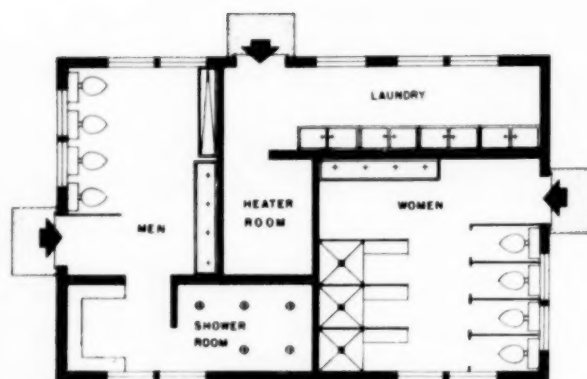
A 22-by-32-foot combination bath and wash house. Plan #2425
